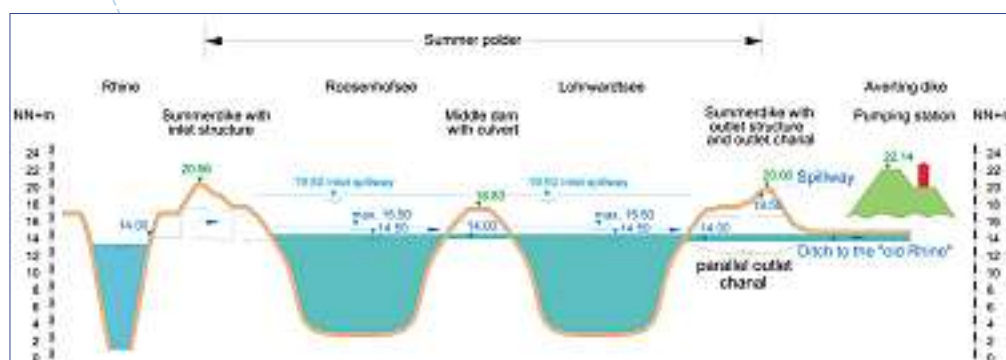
Inlet and outlet structures, cross-section of the summer polder
